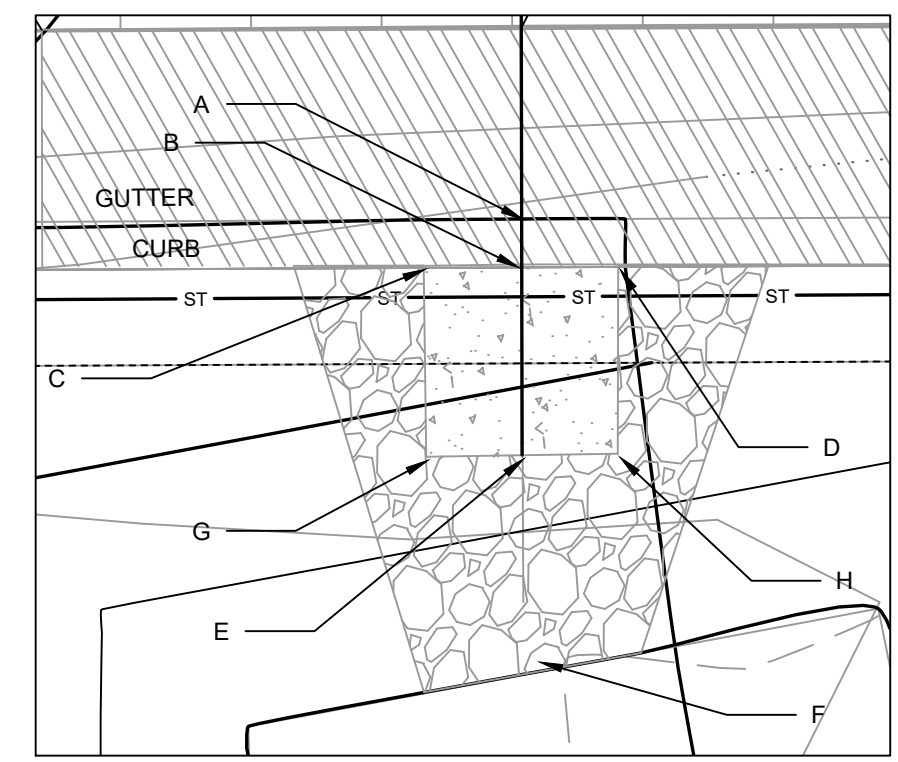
## DETAIL POINT ELEVATIONS/DESCRIPTIONS
